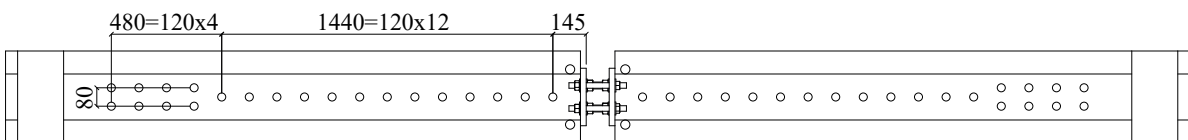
Reinforcement details and shear stud distribution of the test specimens.
